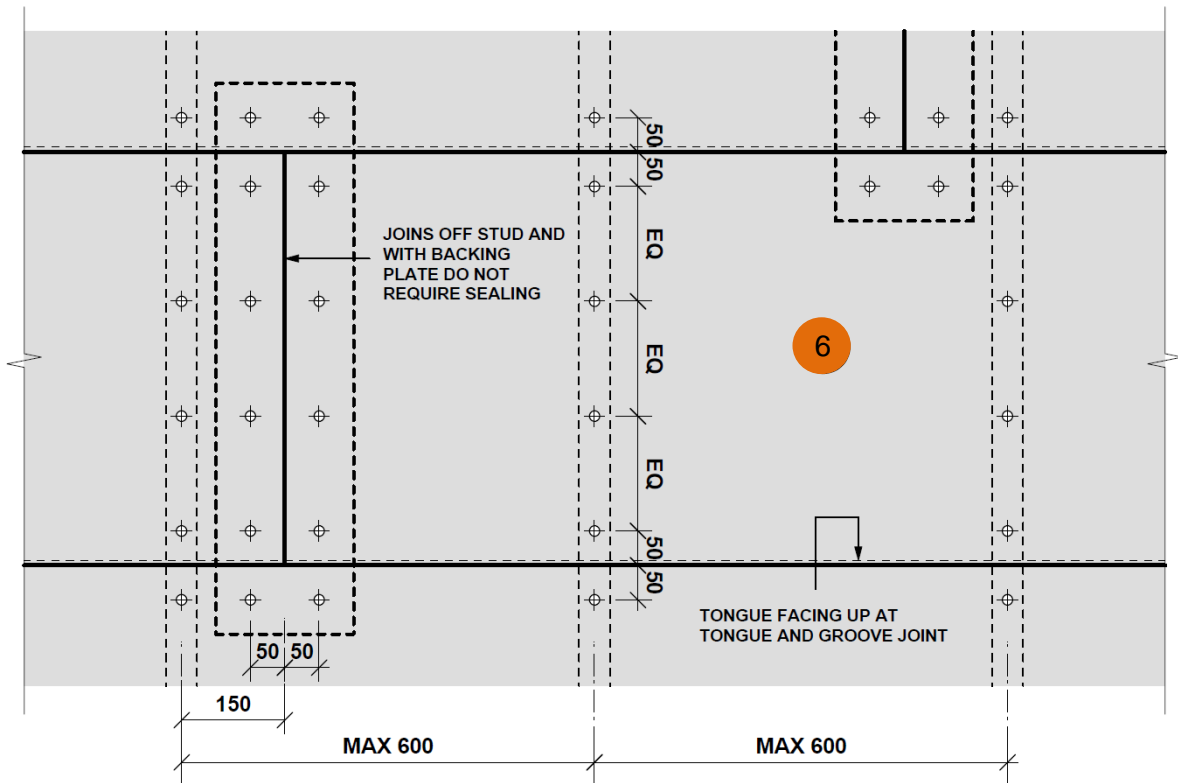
Horizontal INEX>RENDERBOARD Wall System Steel frame – Sheet fixing details
